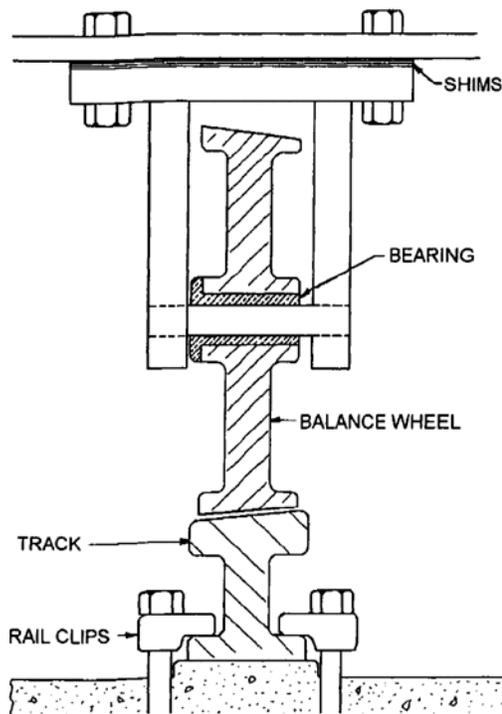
A balance wheel assembly in which the wheel rotates on a stationary shaft
